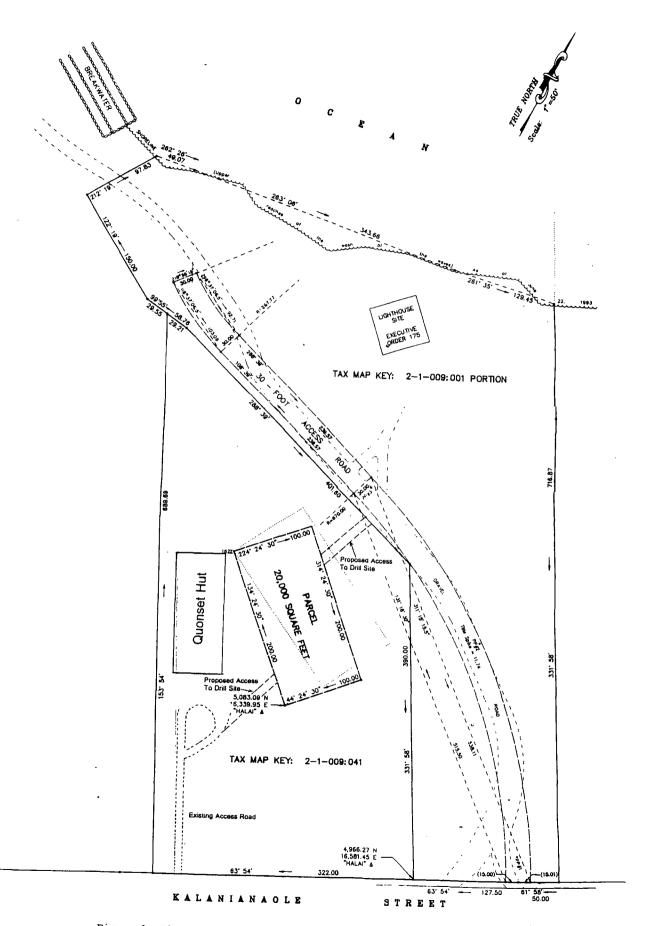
Plot plan for the proposed site showing location of shoreline, drill pad and access road.
